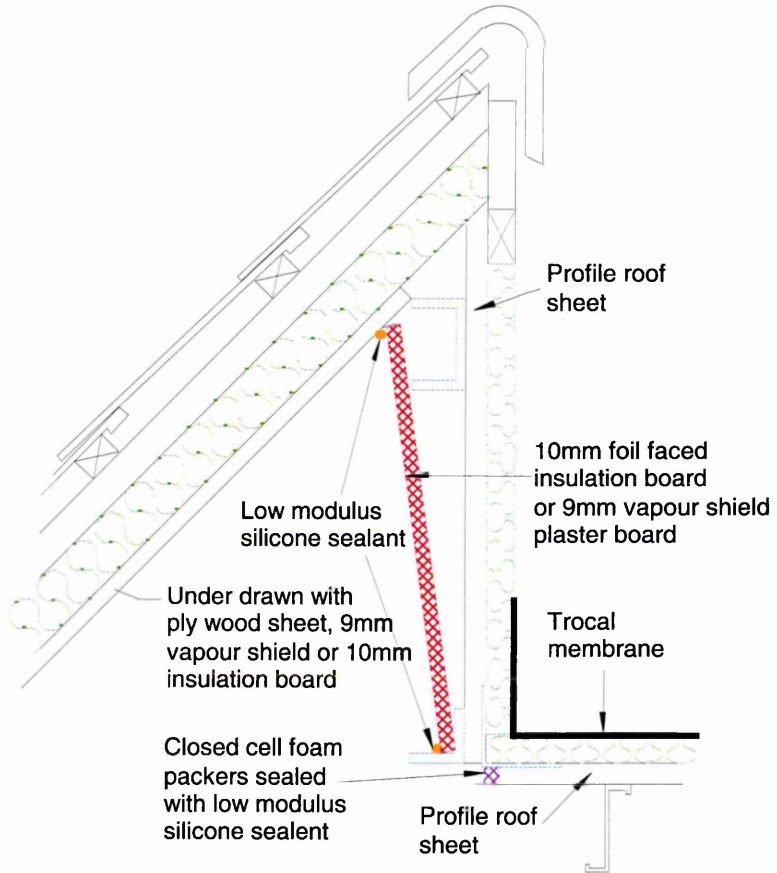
Airseal detail at blockwork wall adjacent to roof sheet eaves detail.
